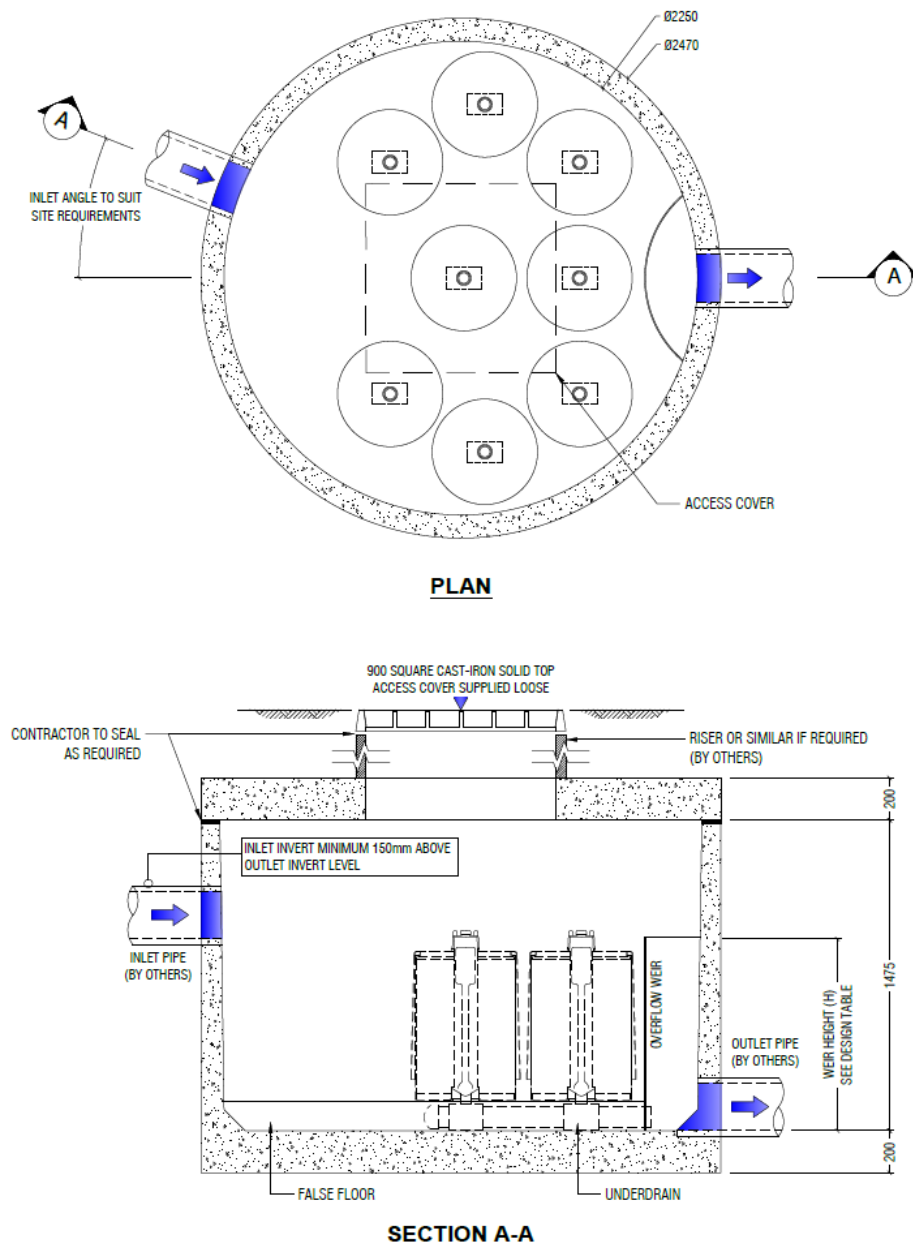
STORMFILTER TYPICAL PLAN VIEW
